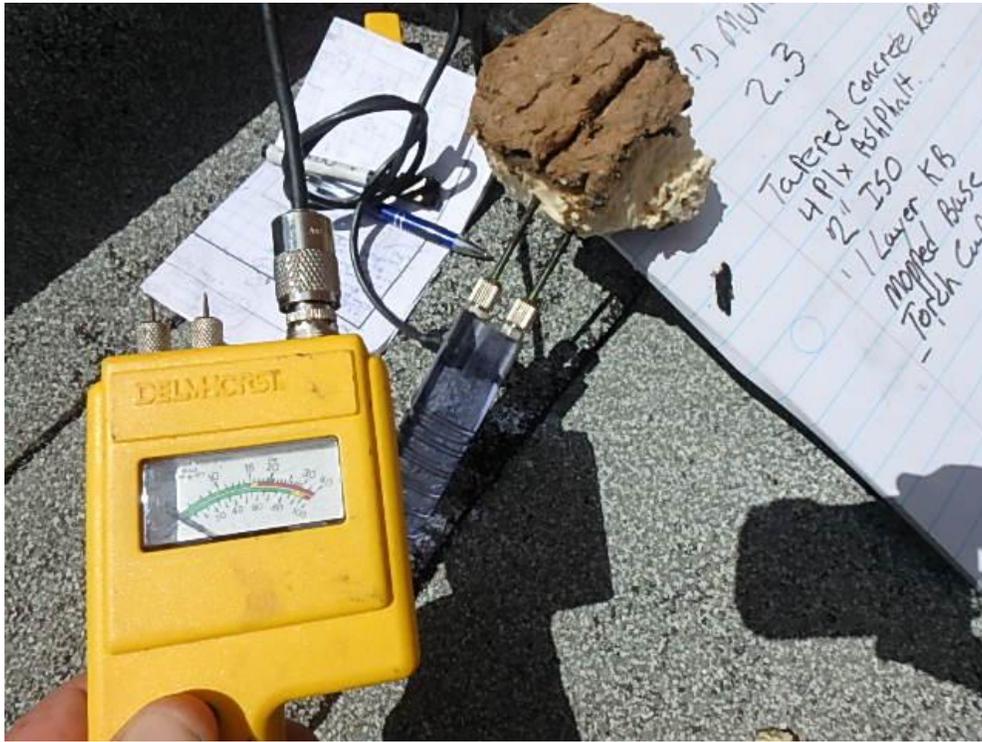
Roof Area 2.1 – Roof insulation moisture test showing high levels of moisture.
